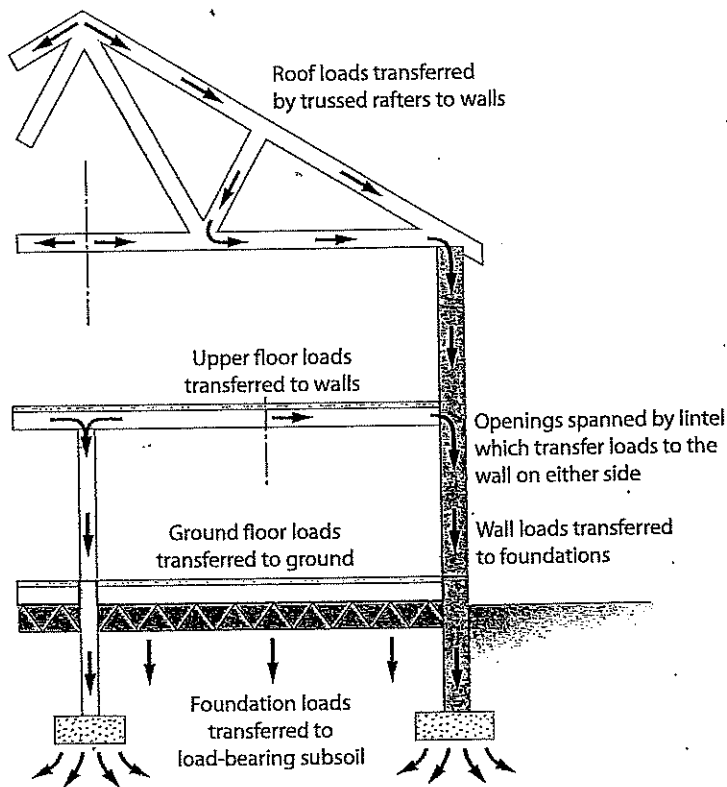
Loads from walls and floors are supported and spread out by the foundations.
